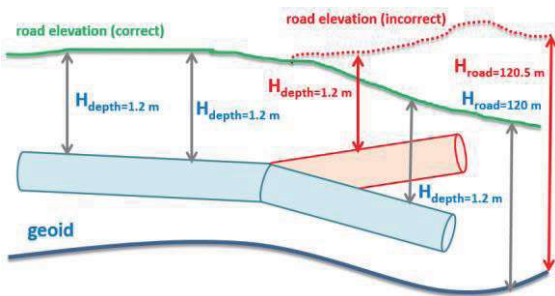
Numerical case of pipeline spatial dislocation caused by incorrect road elevation information (red section on the right)
